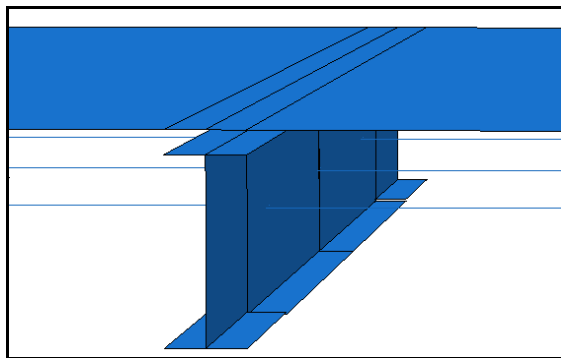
Arrangement of the Plate and Beam Elements for a Typical Cross-Section
